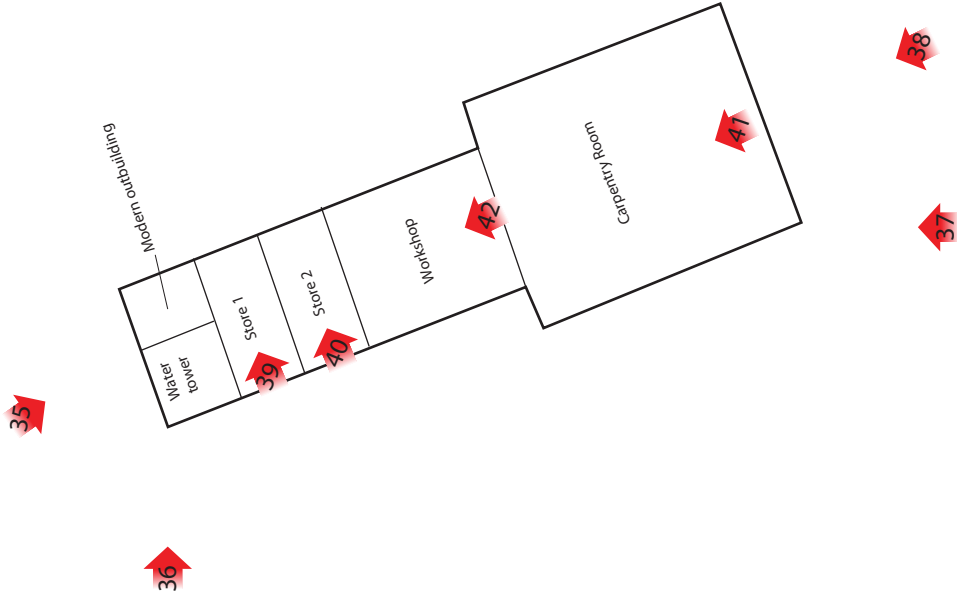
Location and orientation of photographs of building 4 (numbered arrows refer to plate numbers; red lines denote modern wall divisions). Not to scale.
